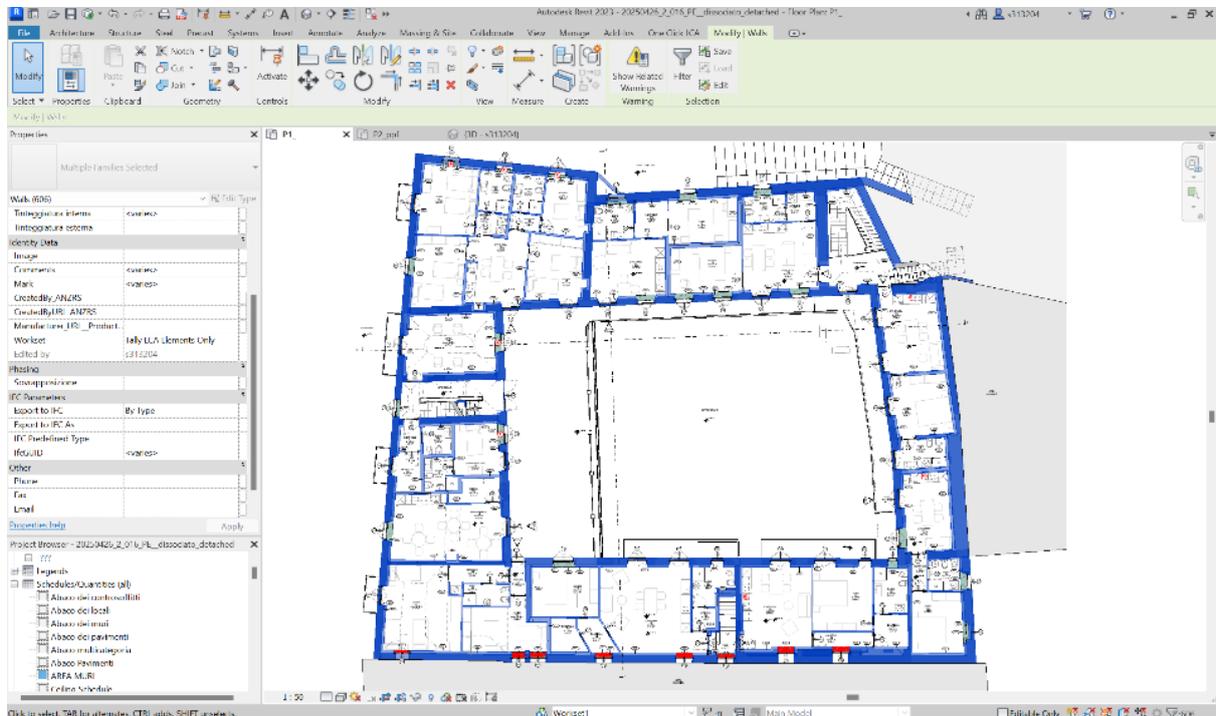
Workset 'only LCA Elements' _ First floor Plan
